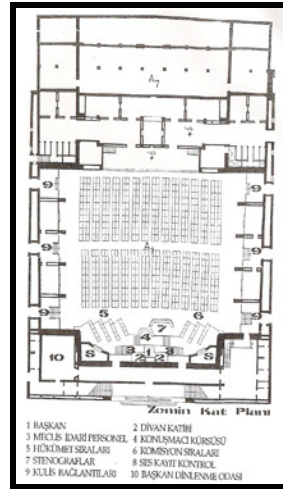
17 Ground Floor Plan of Original General Council Hall
